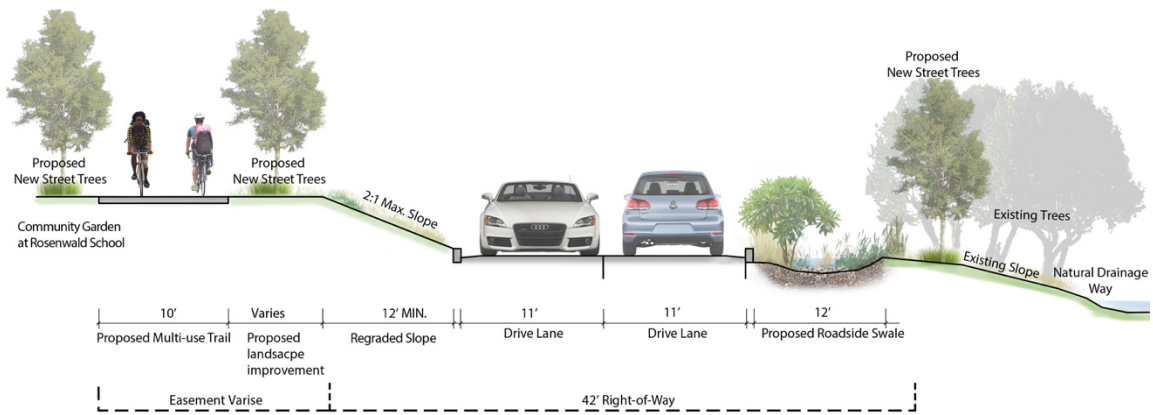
Section D-D— Proposed Street Cross Section 2 (By author)
